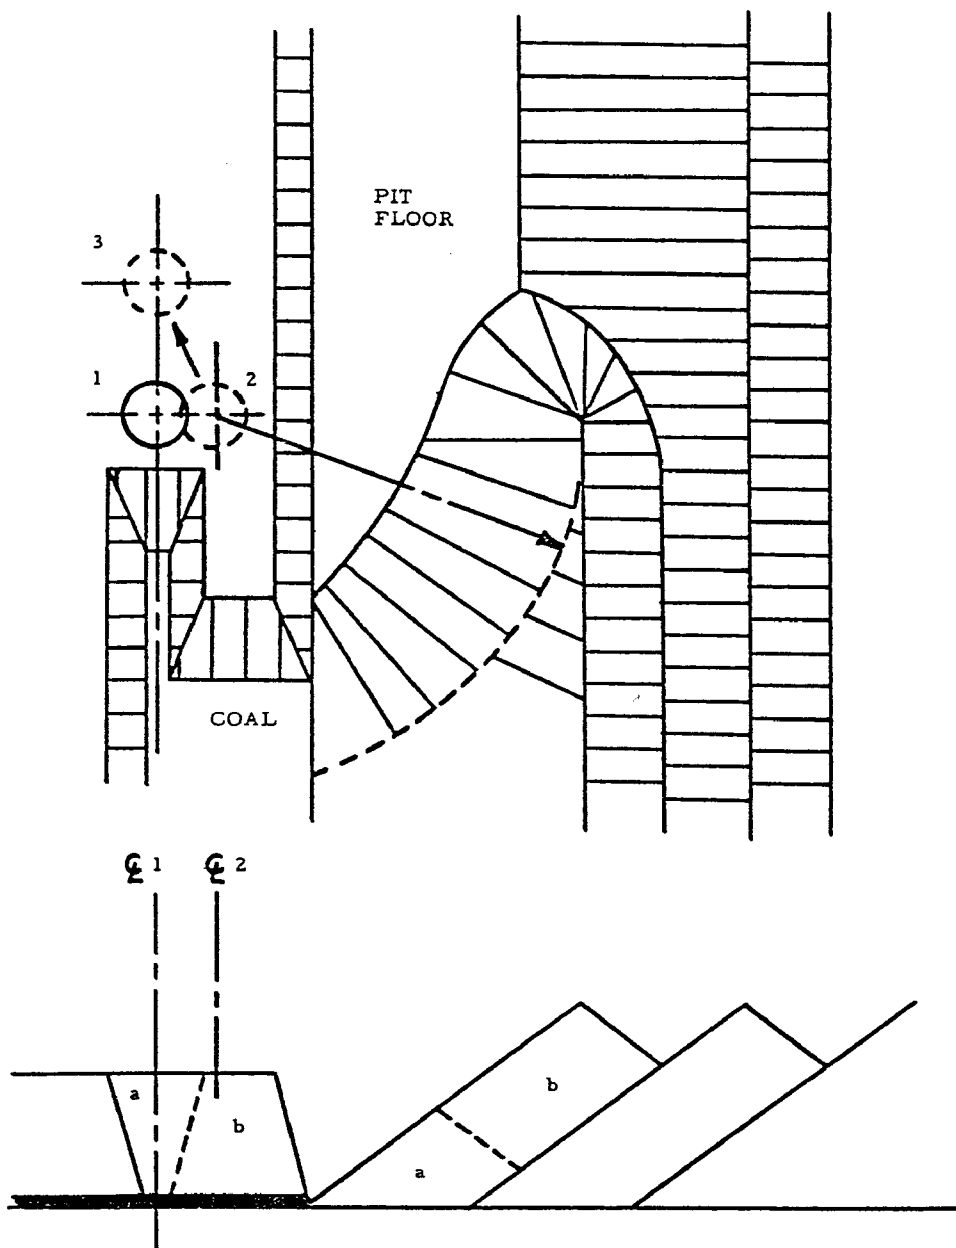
Plan and Section Views Showing Dragline Keycutting Procedures
